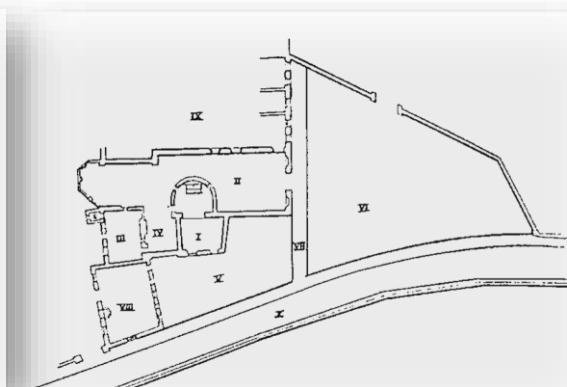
Plan of the San Michele Arcangelo Complex with Cappella Bovi on Riviera Tiso da Camposampiero (1816-1876) (Maiolo, 2001).
